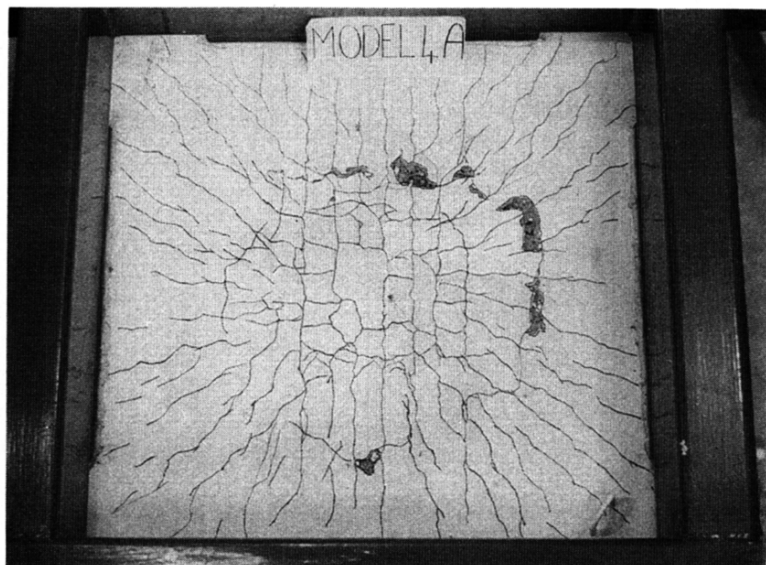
Shear punching failure of heavily reinforced slab-column specimen ($\rho = 2.0\%$)
